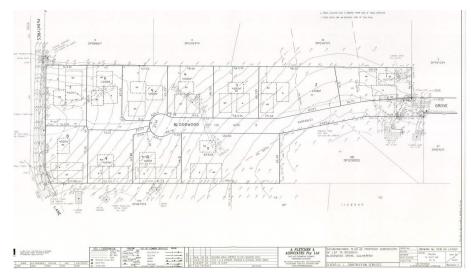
Amended subdivision layout showing 11 lots and a shared ROW to McIntyres Lane (November 2018).
